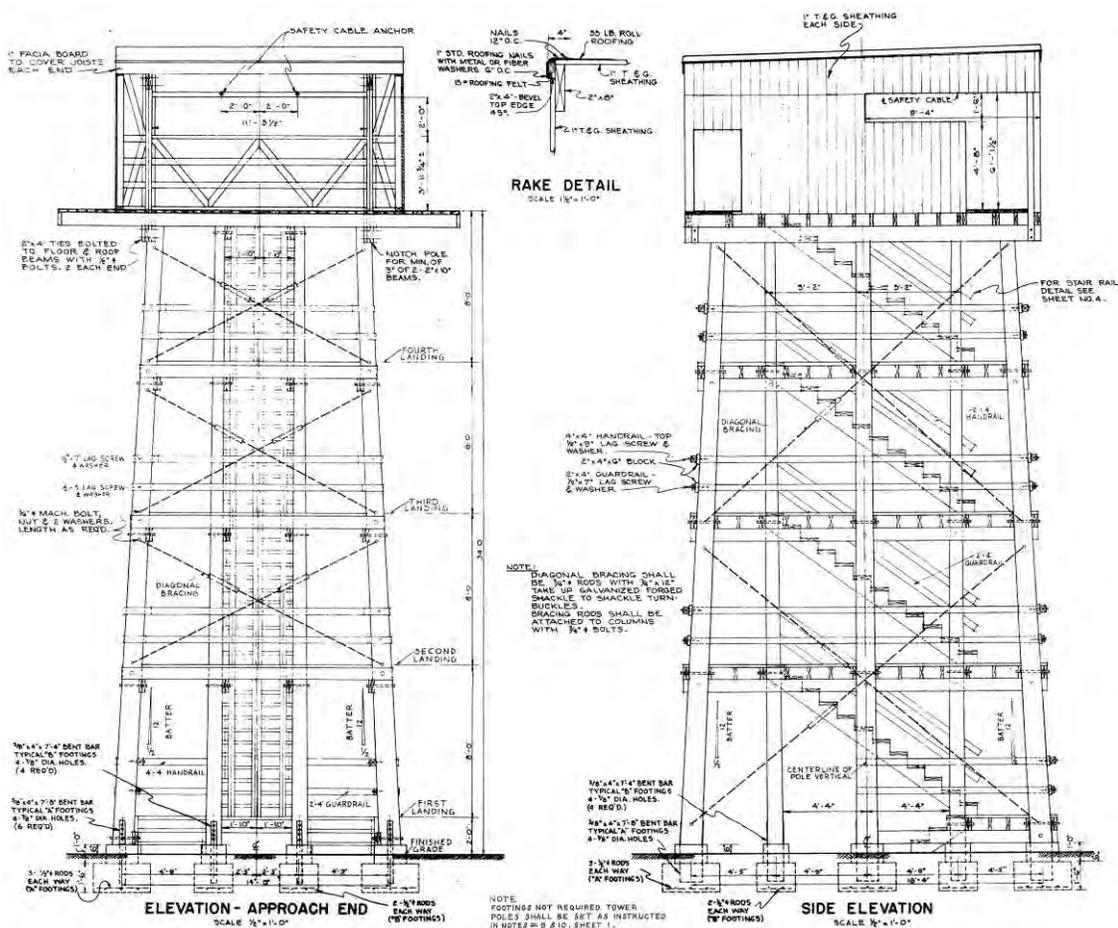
Mock-up tower for airborne training, elevations, Fort Bragg, NC, 1952 (standard drawing 28-13-59 sheet 5 of 6; mock-up tower for airborne training, elevations; 11 April 1952).
